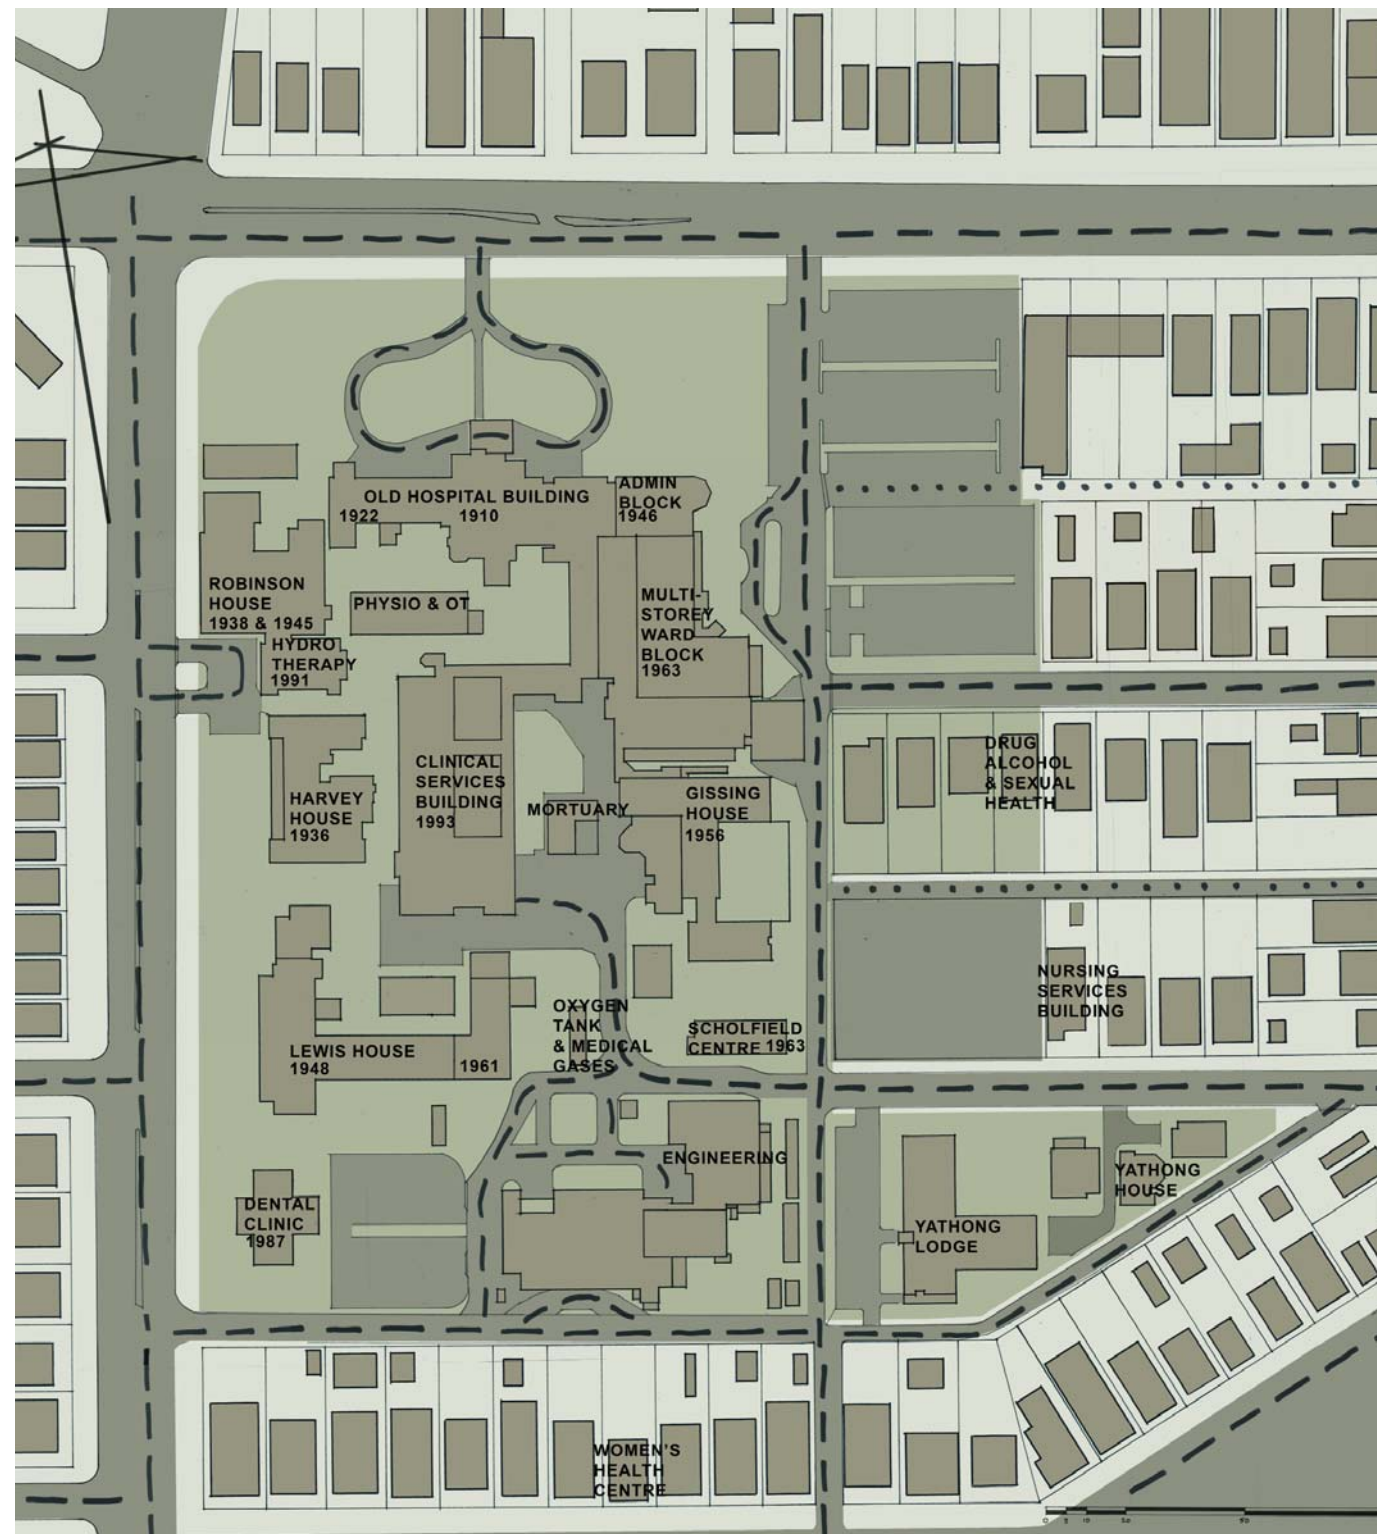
Wagga Wagga Base Hospital Existing Buildings
